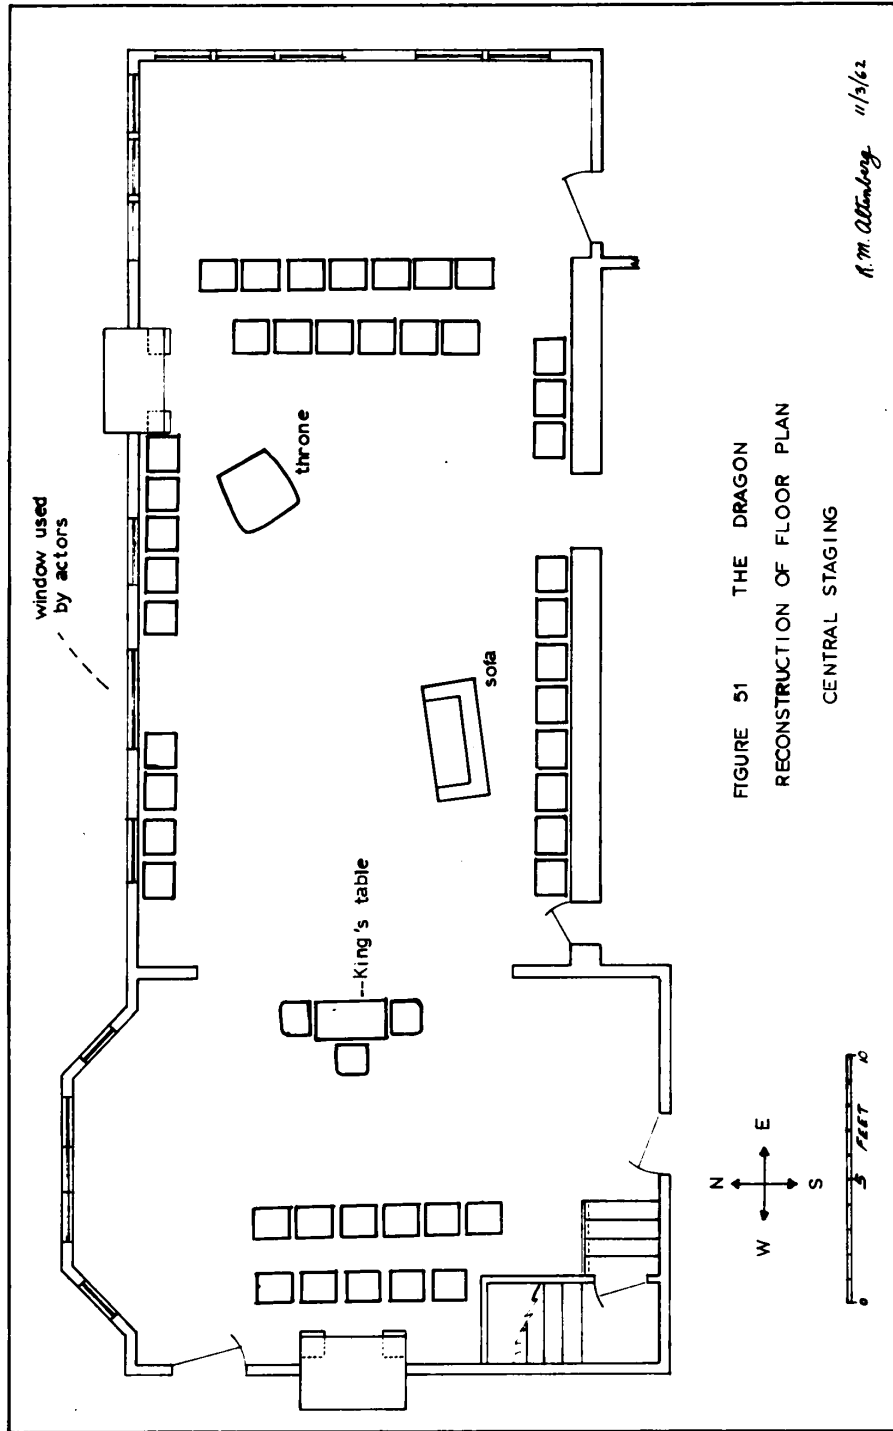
Reconstruction of central staging floor plan, *The Dragon*.
